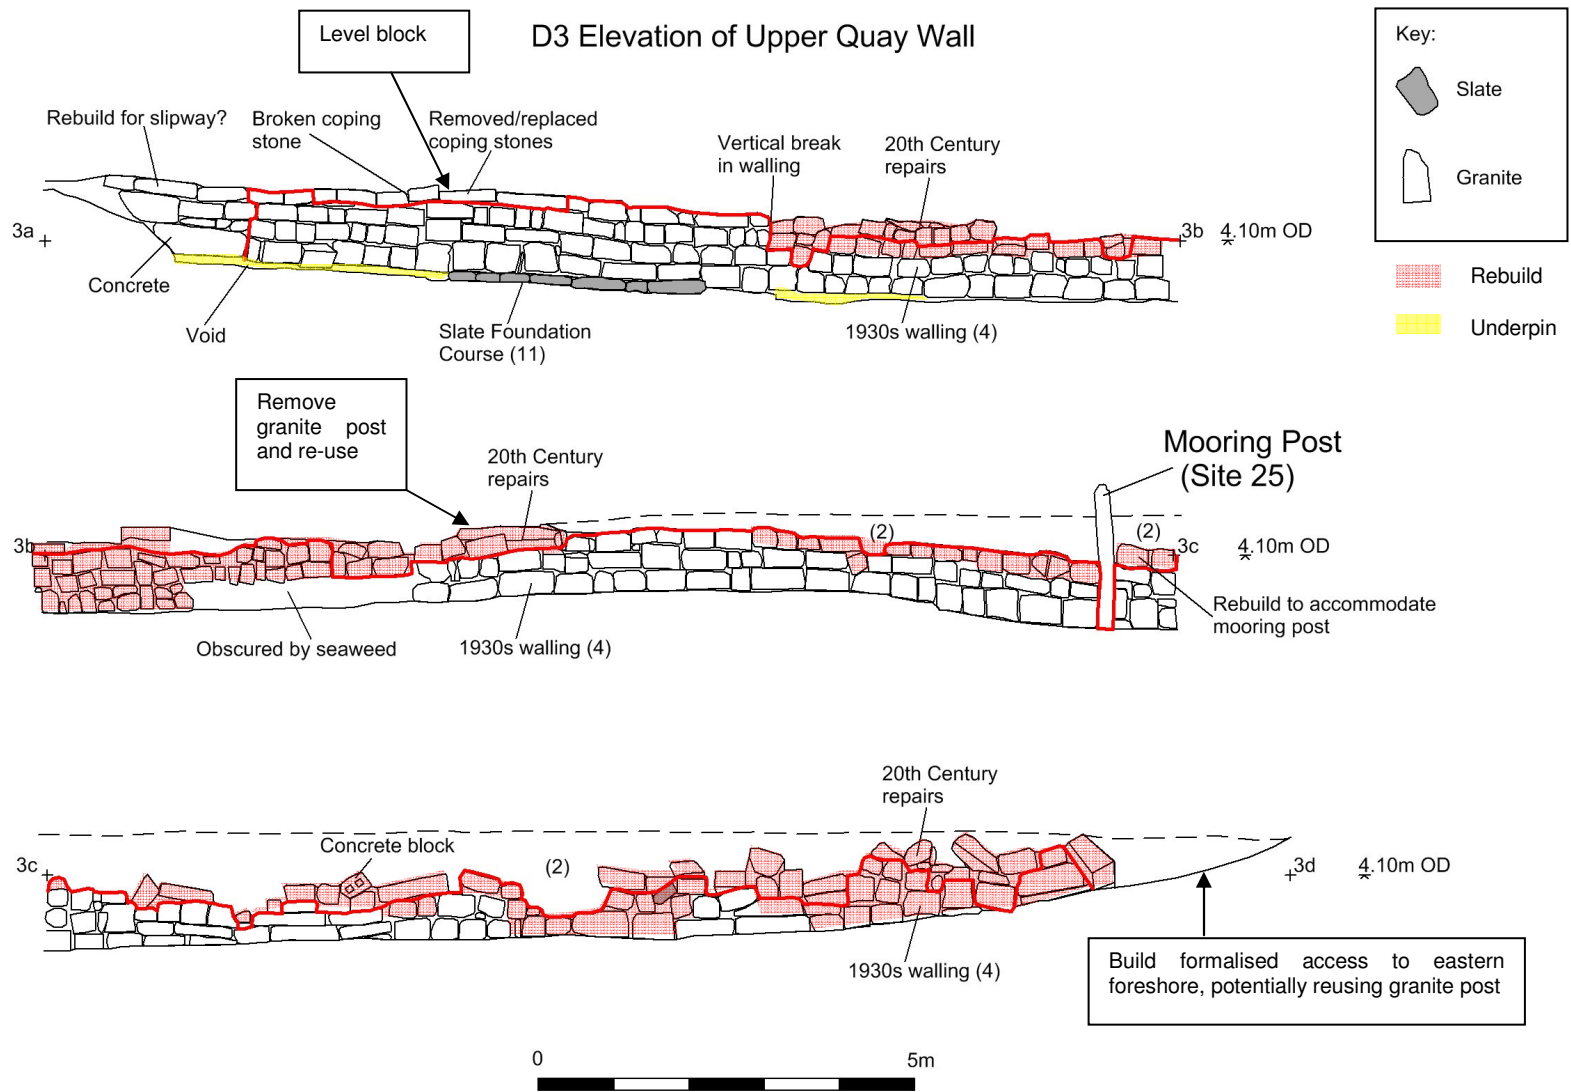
Elevation drawing of Upper Quay Wall showing rebuild requirements
